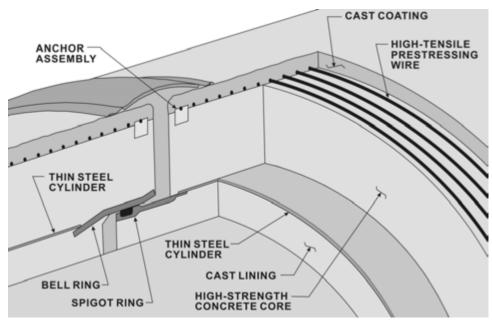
Cross section of a prestressed concrete cylinder pipe, ECP-type (Shenkirk, 2013)
